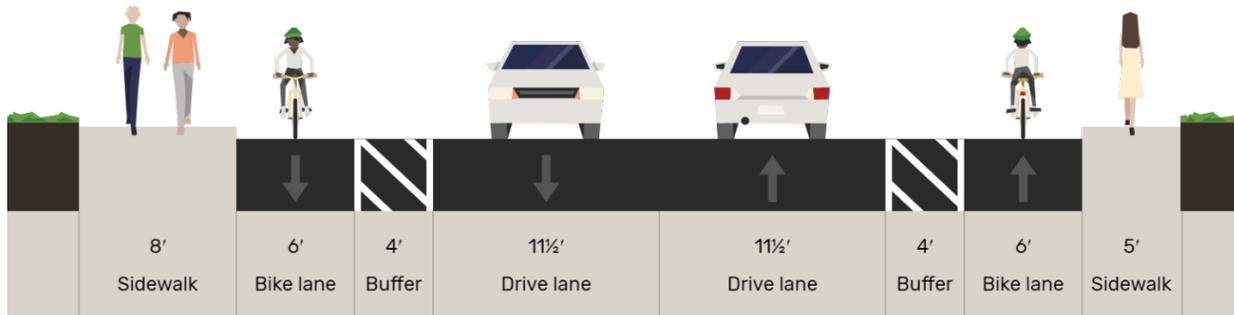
Saratoga Street – 300' east of Annvoy Street – Looking west
